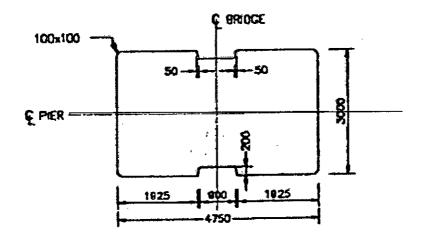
Section of Pier for P11 and P12 (All Dimension in mm)
